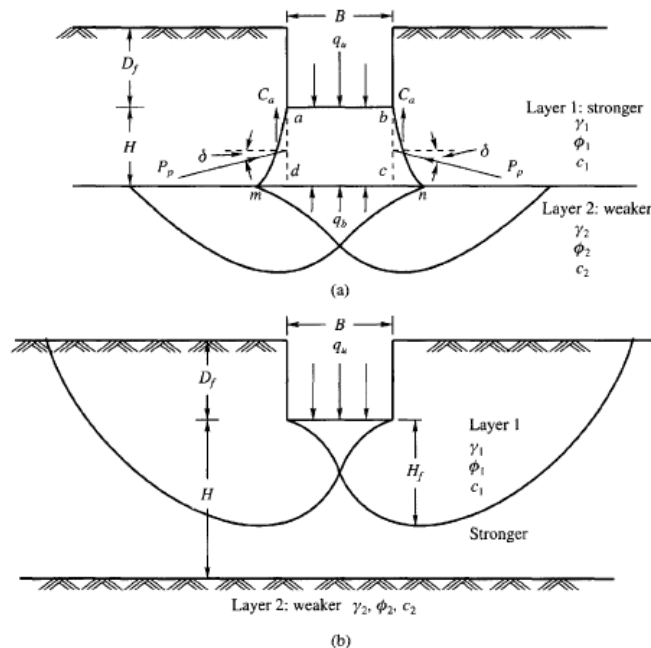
Failure of soil below strip footing under vertical load on strong layer overlying weak deposit (after Meyerhof and Hanna, 1978)
